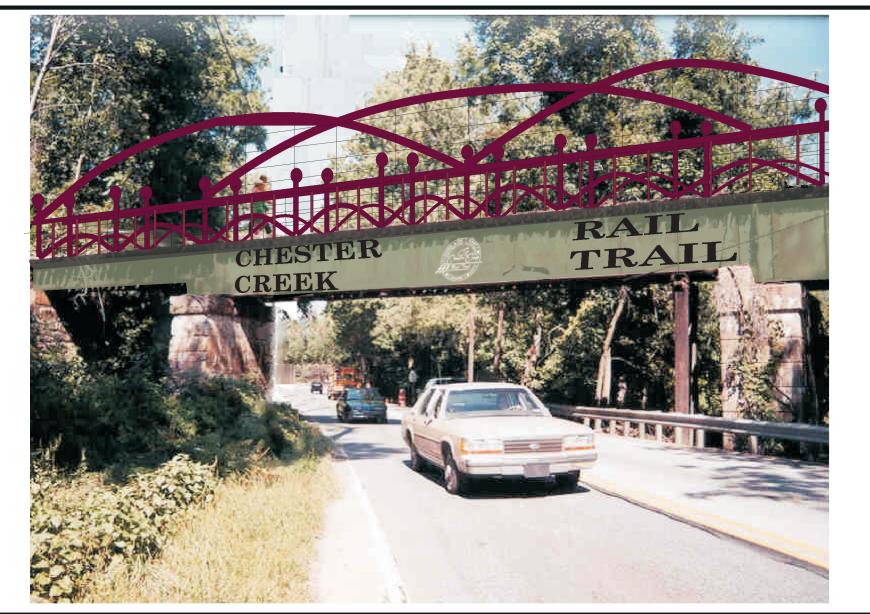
shows how the bridge over Pennell Road and Chester Creek might look, with the girders painted and fencing added.
